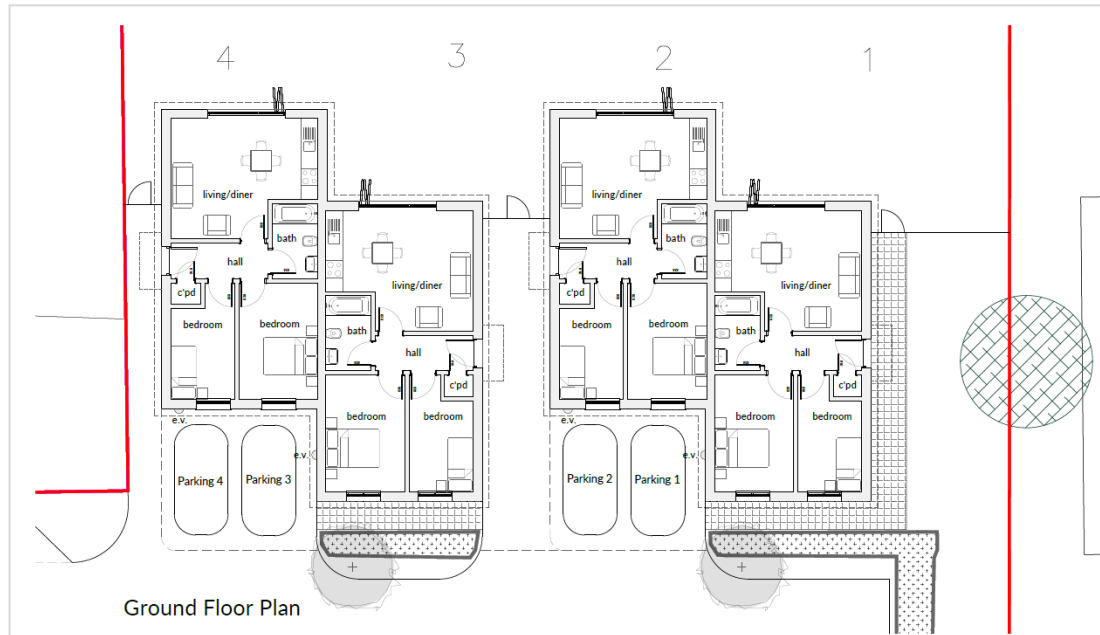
PROPOSED GROUND FLOOR PLAN (DRAWING NO. 23.53-PL06)
